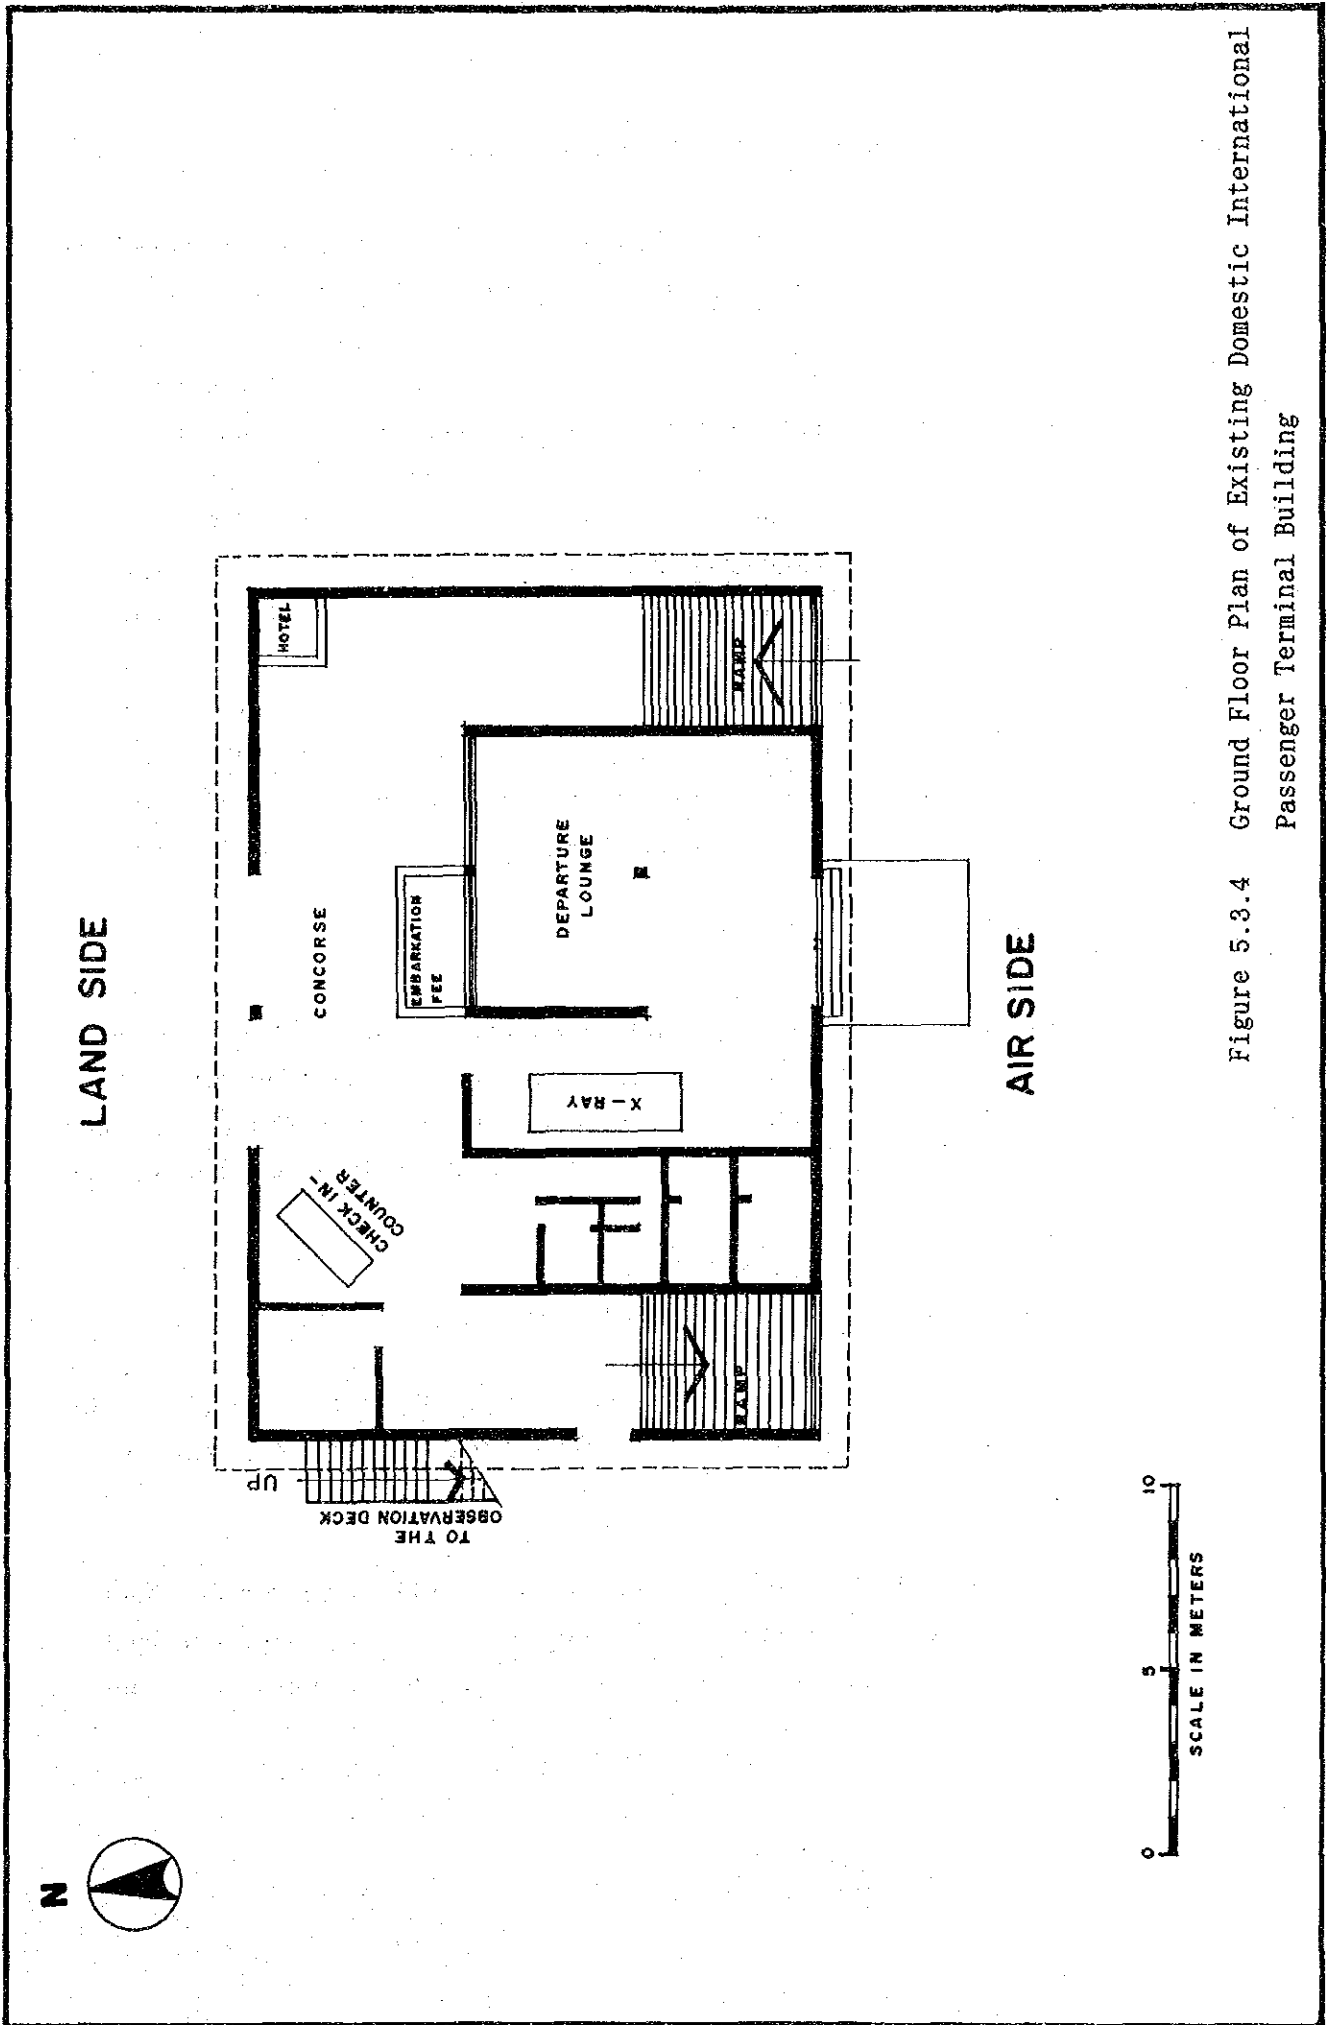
Ground Floor Plan of Existing Domestic International Passenger Terminal Building
